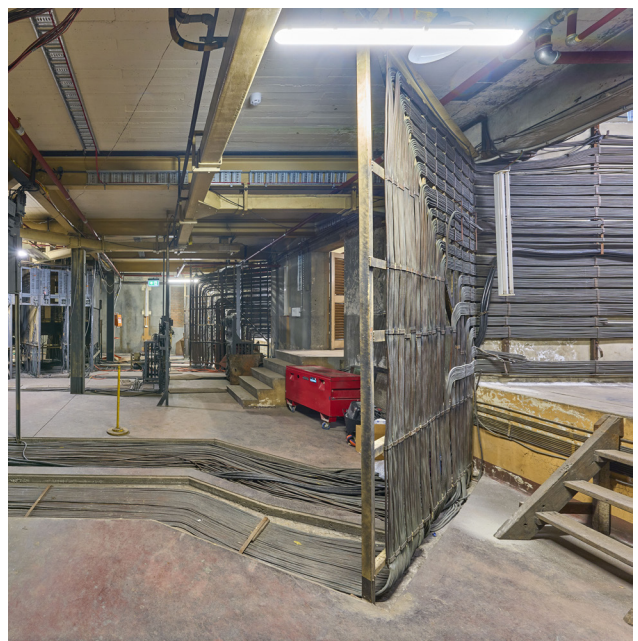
The extensive cabling in the Cable Room of the Control Room Building, 2023 (courtesy of Chris Bennett: Evolving Picture).
